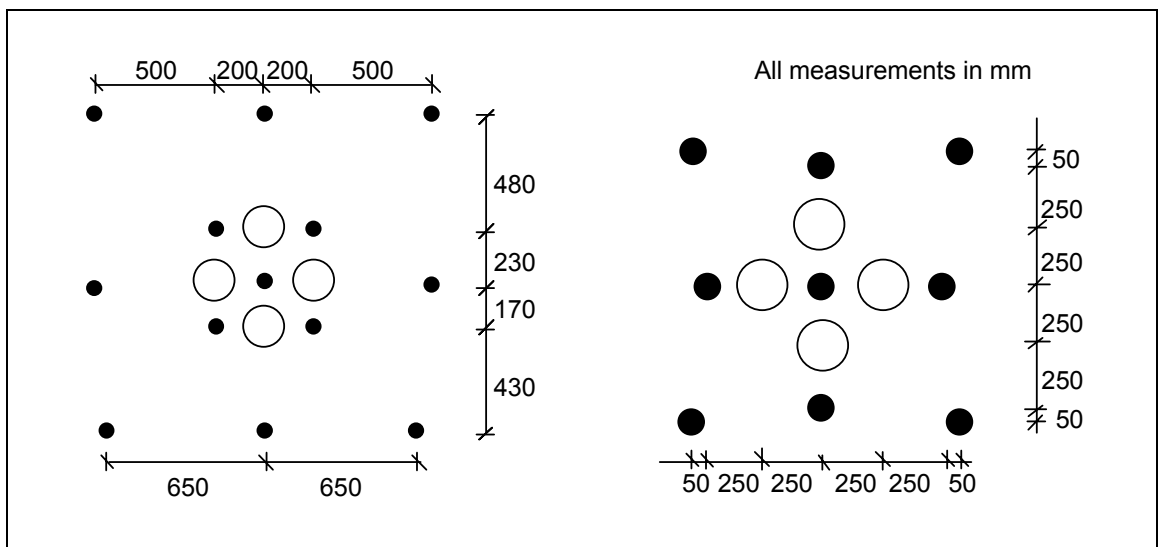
Examples of large hole cuts, 48 mm to the left and 64 mm to the right. The cuts are designed for 5 m drilled length.
